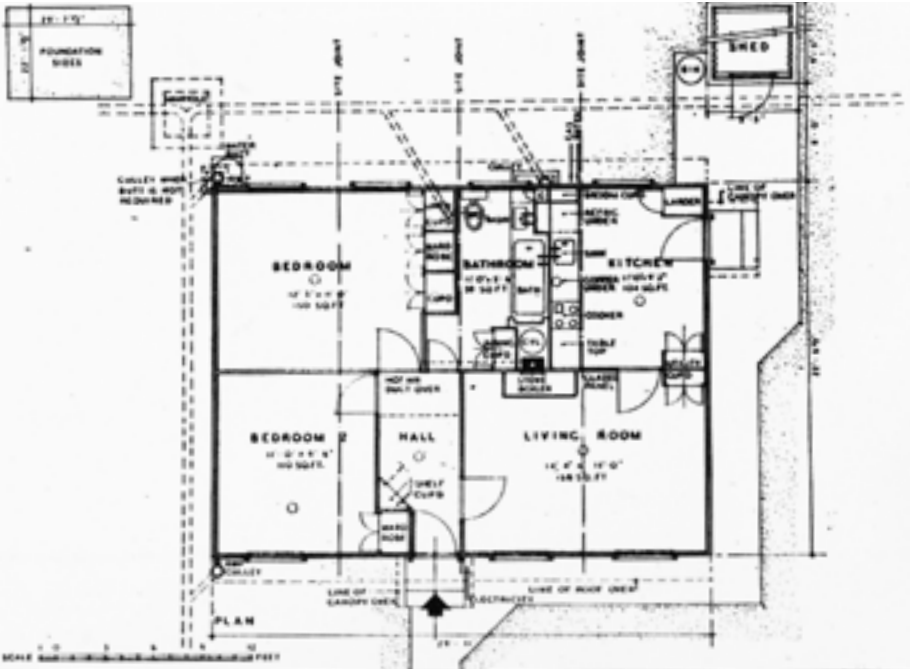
Plan of AIROH aluminium house showing division into four prefabricated segments
